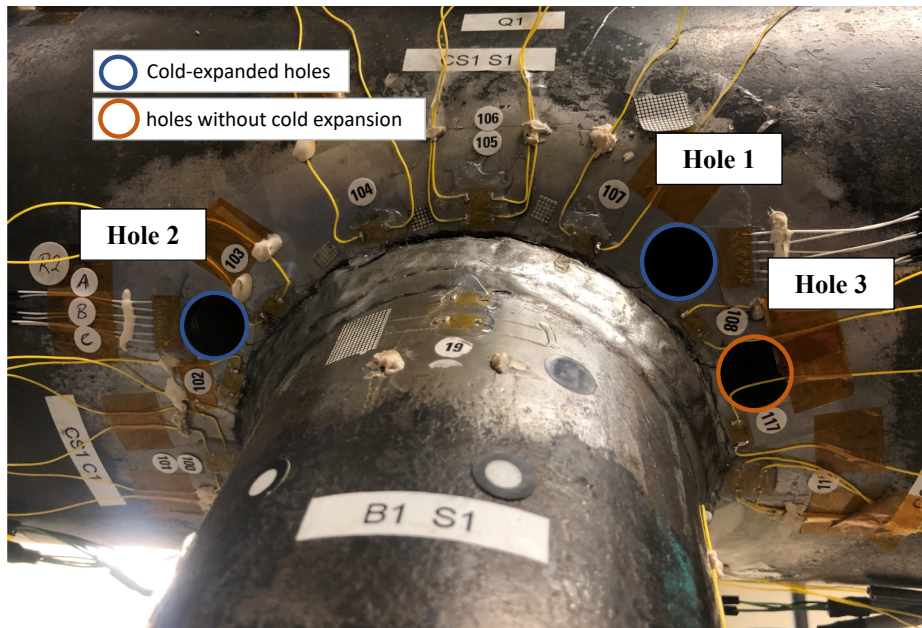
Second repair attempt, new crack deflecting hole (hole 3) drilled at 70°.
